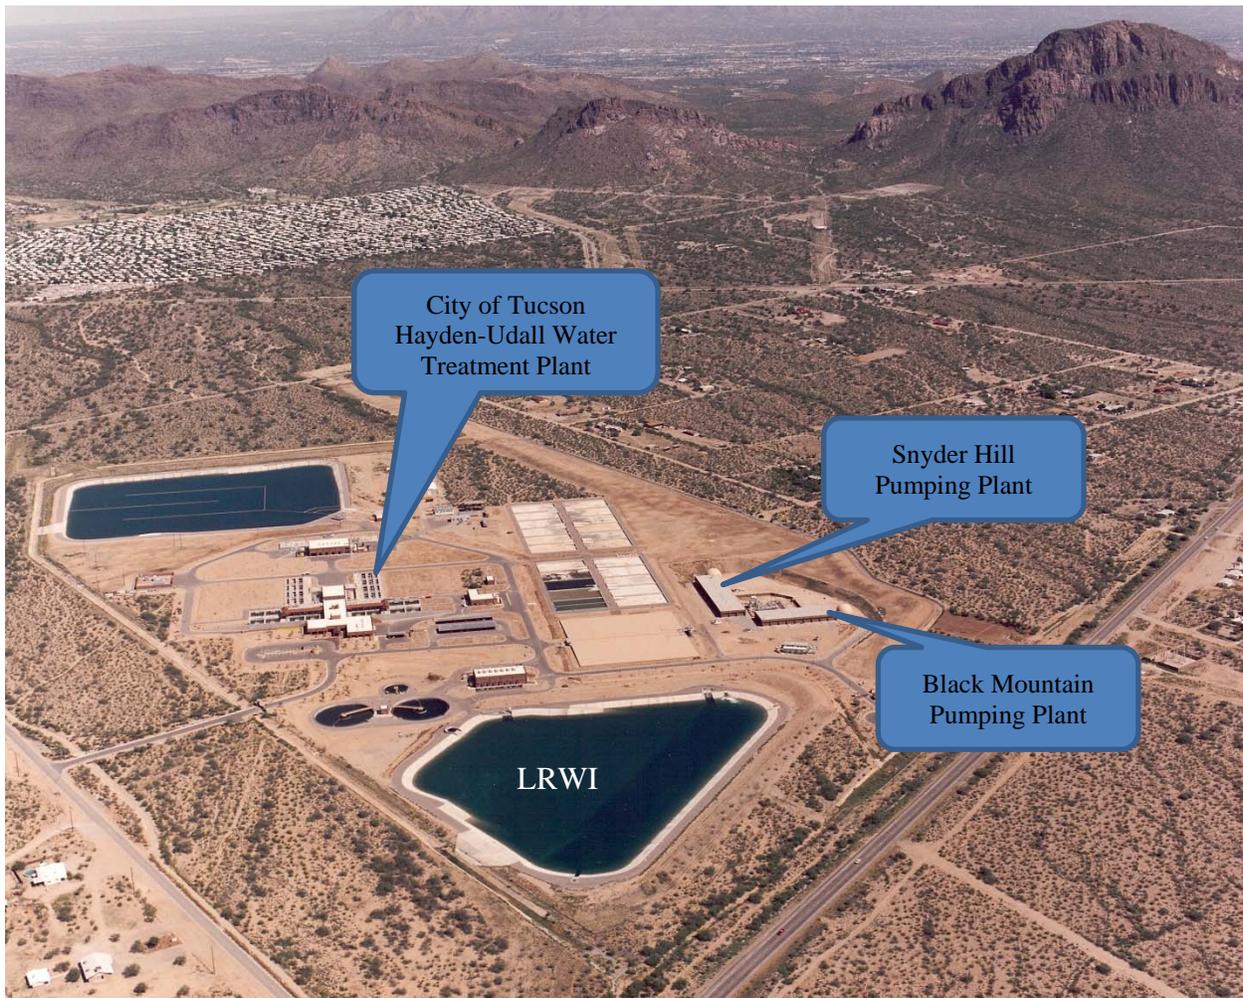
Snyder Hill and Black Mountain Pumping Plants
